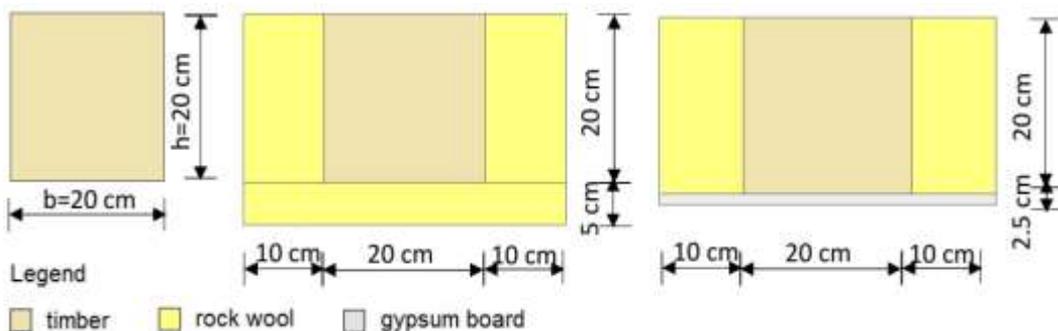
Cross sections of the beams, a) Case study 1, b) Case study 2, c) Case study 3
